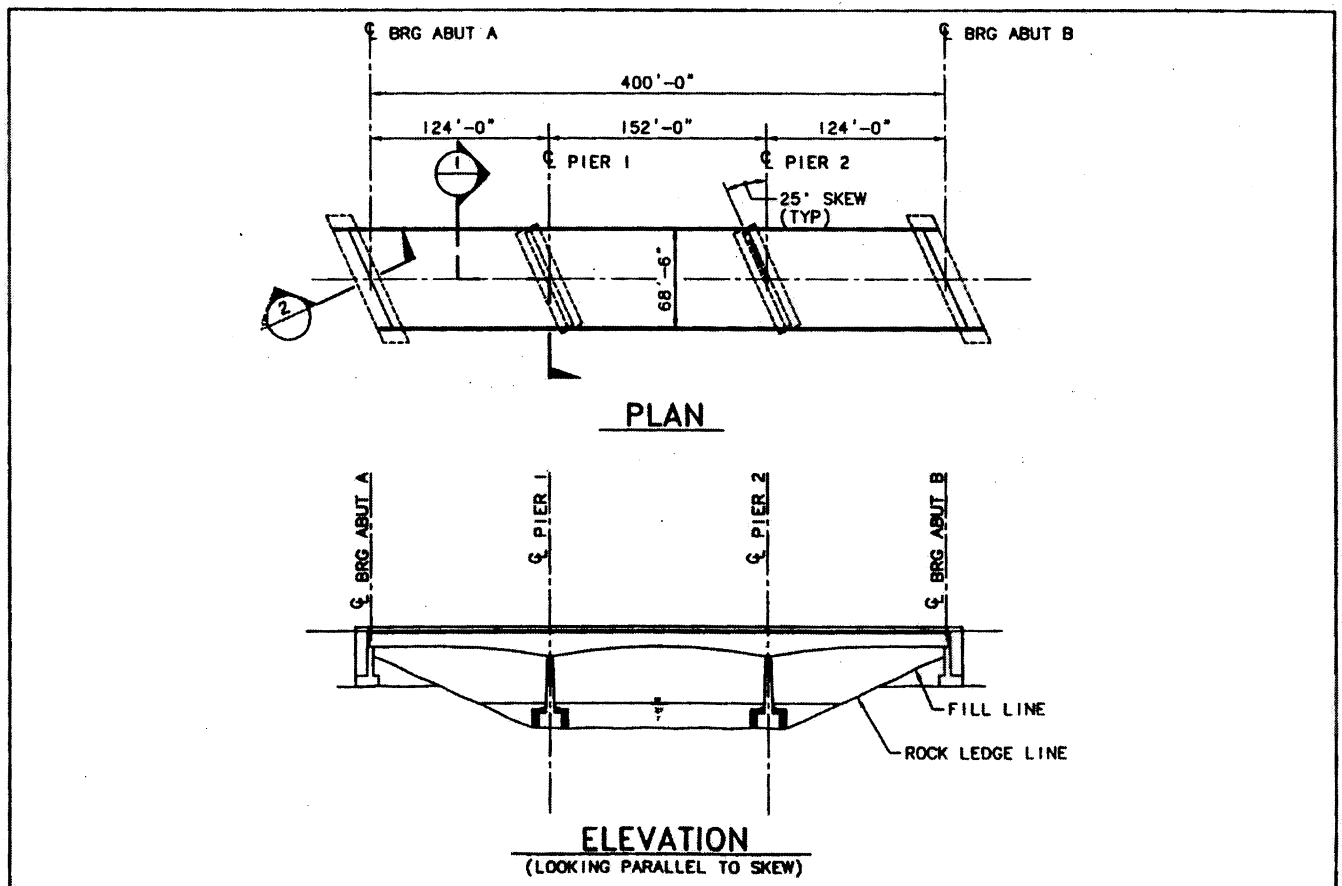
Bridge No. 2 – Plan and Elevation
